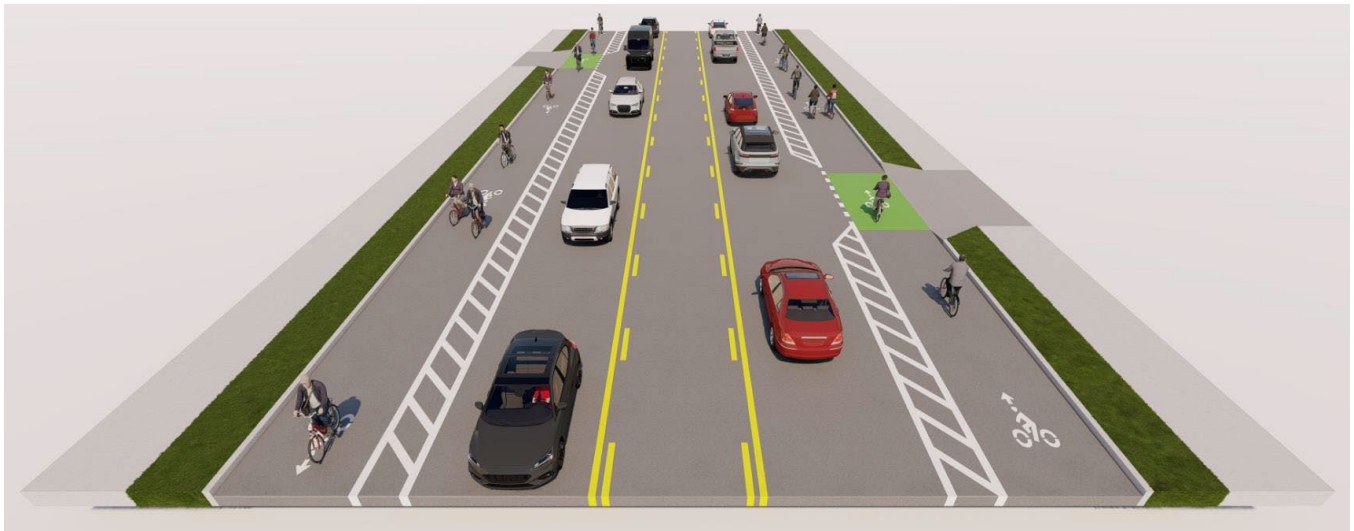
Alternative 1 - Ft. Vancouver Way to Falk Road
